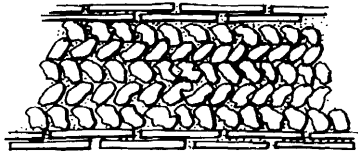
Flint herring-bone walling, typical construction with tile bonding courses (D S Neal)
